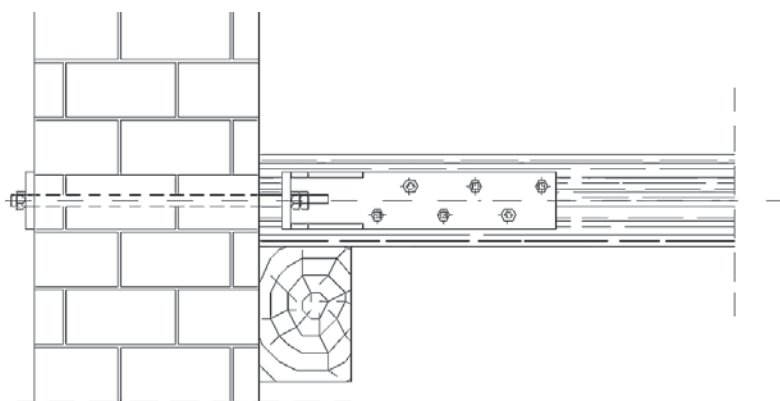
Strengthening interventions, diffuse wooden floor connections to the masonry wall
